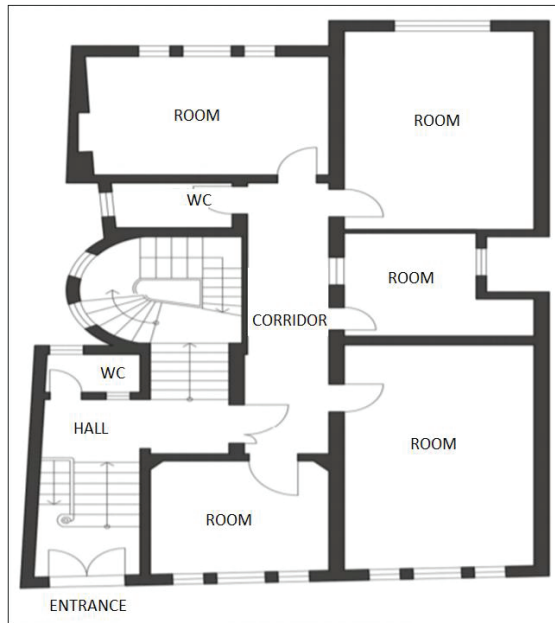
Ground floor plan of Selim Bey Mansion. (Source : İgüs 2015)
